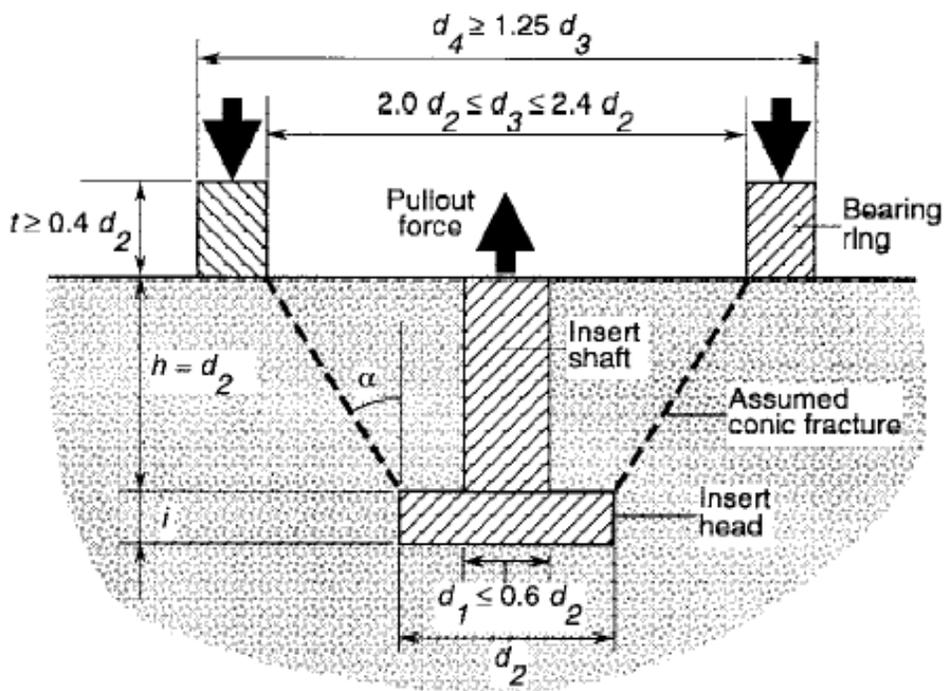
Cross section of pullout test (ASTM C 900-06)
